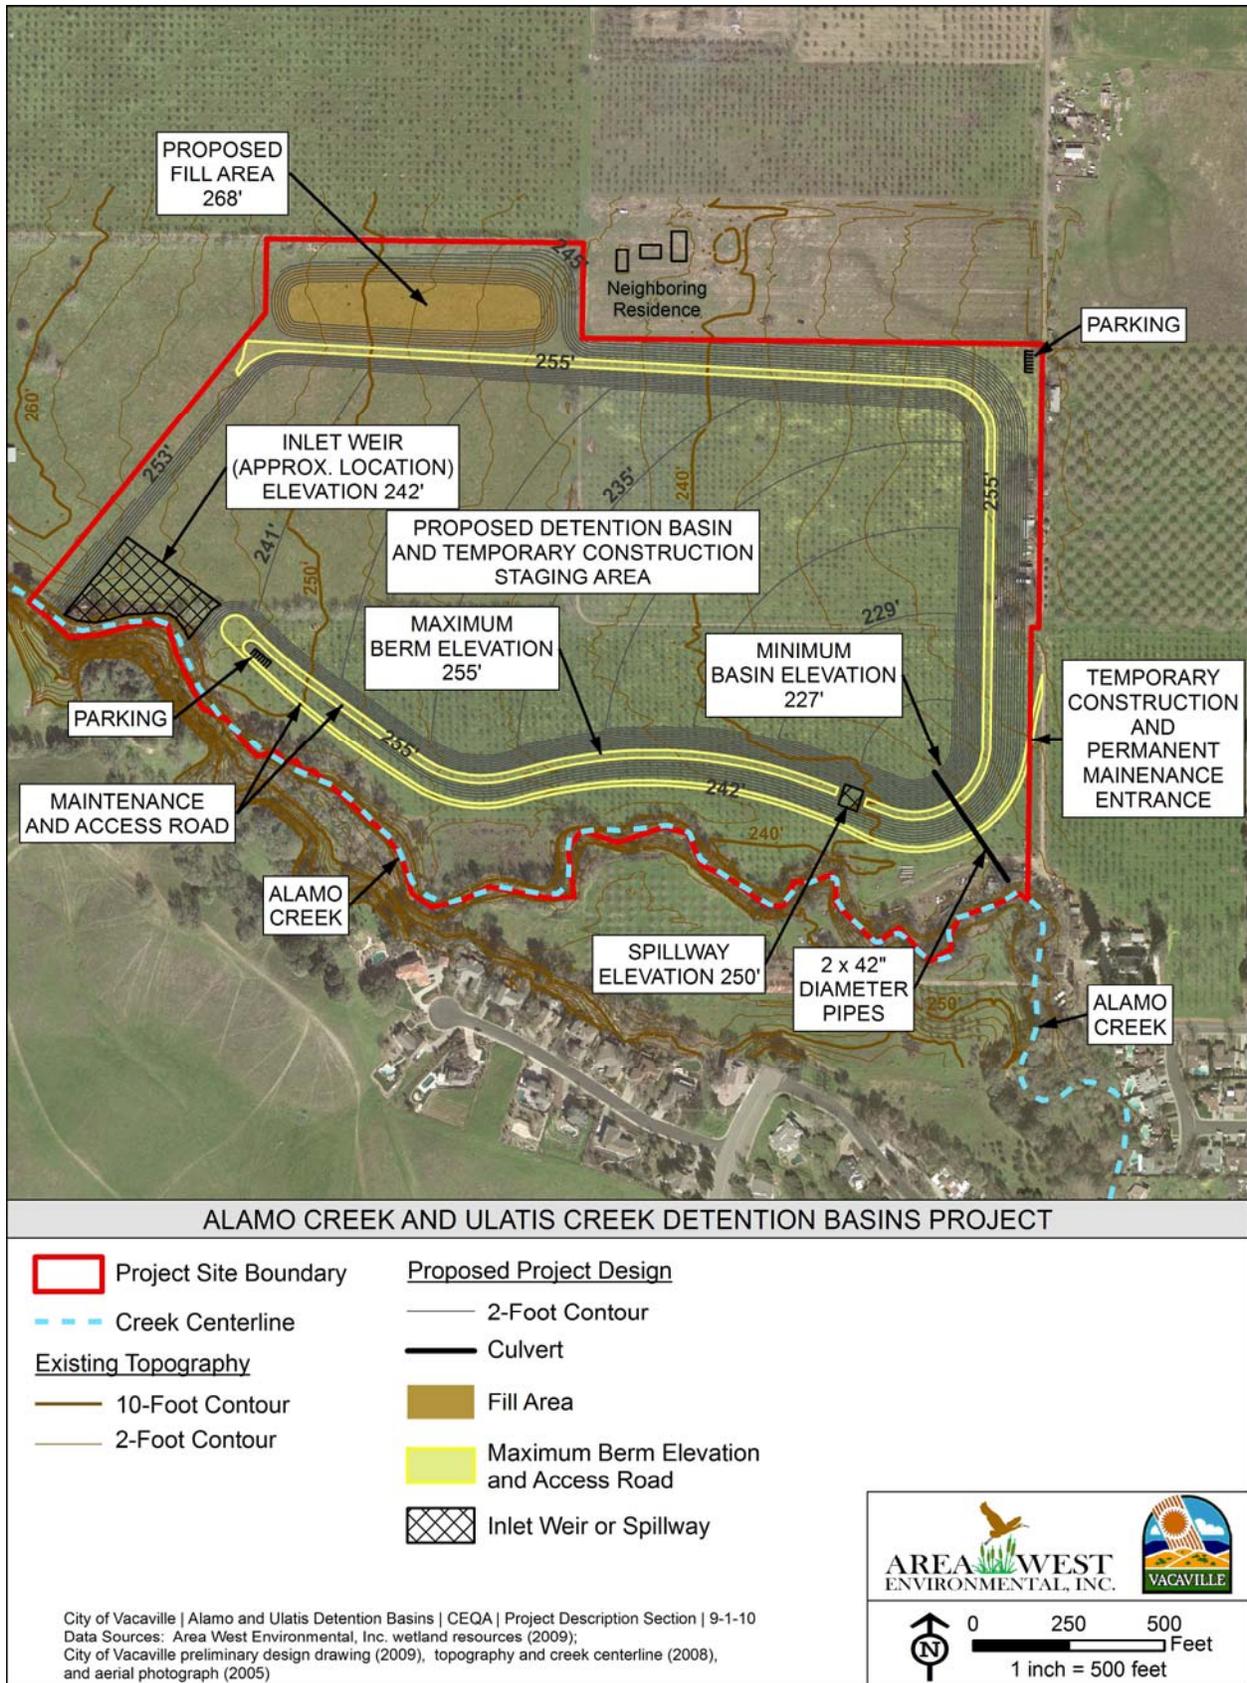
Preliminary Alamo Detention Basin Design Drawing
